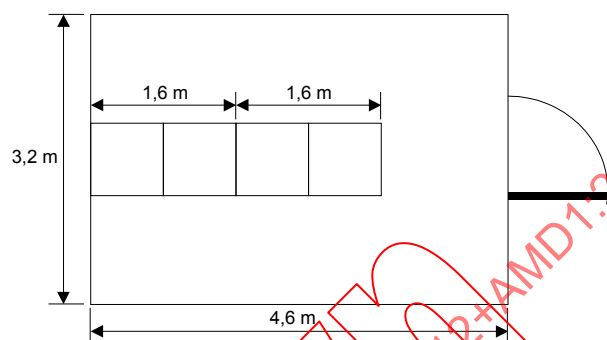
Minimum room dimensions to support distributors containing between 501 and 1 000 outlets
